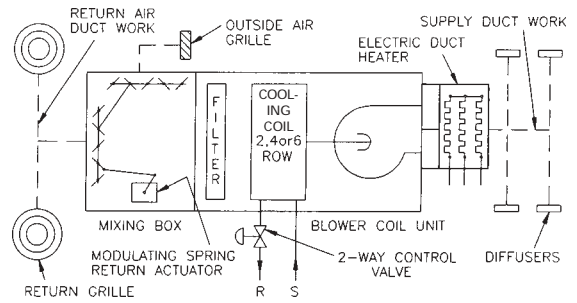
Two-pipe with electric heat and mixing box typical application
